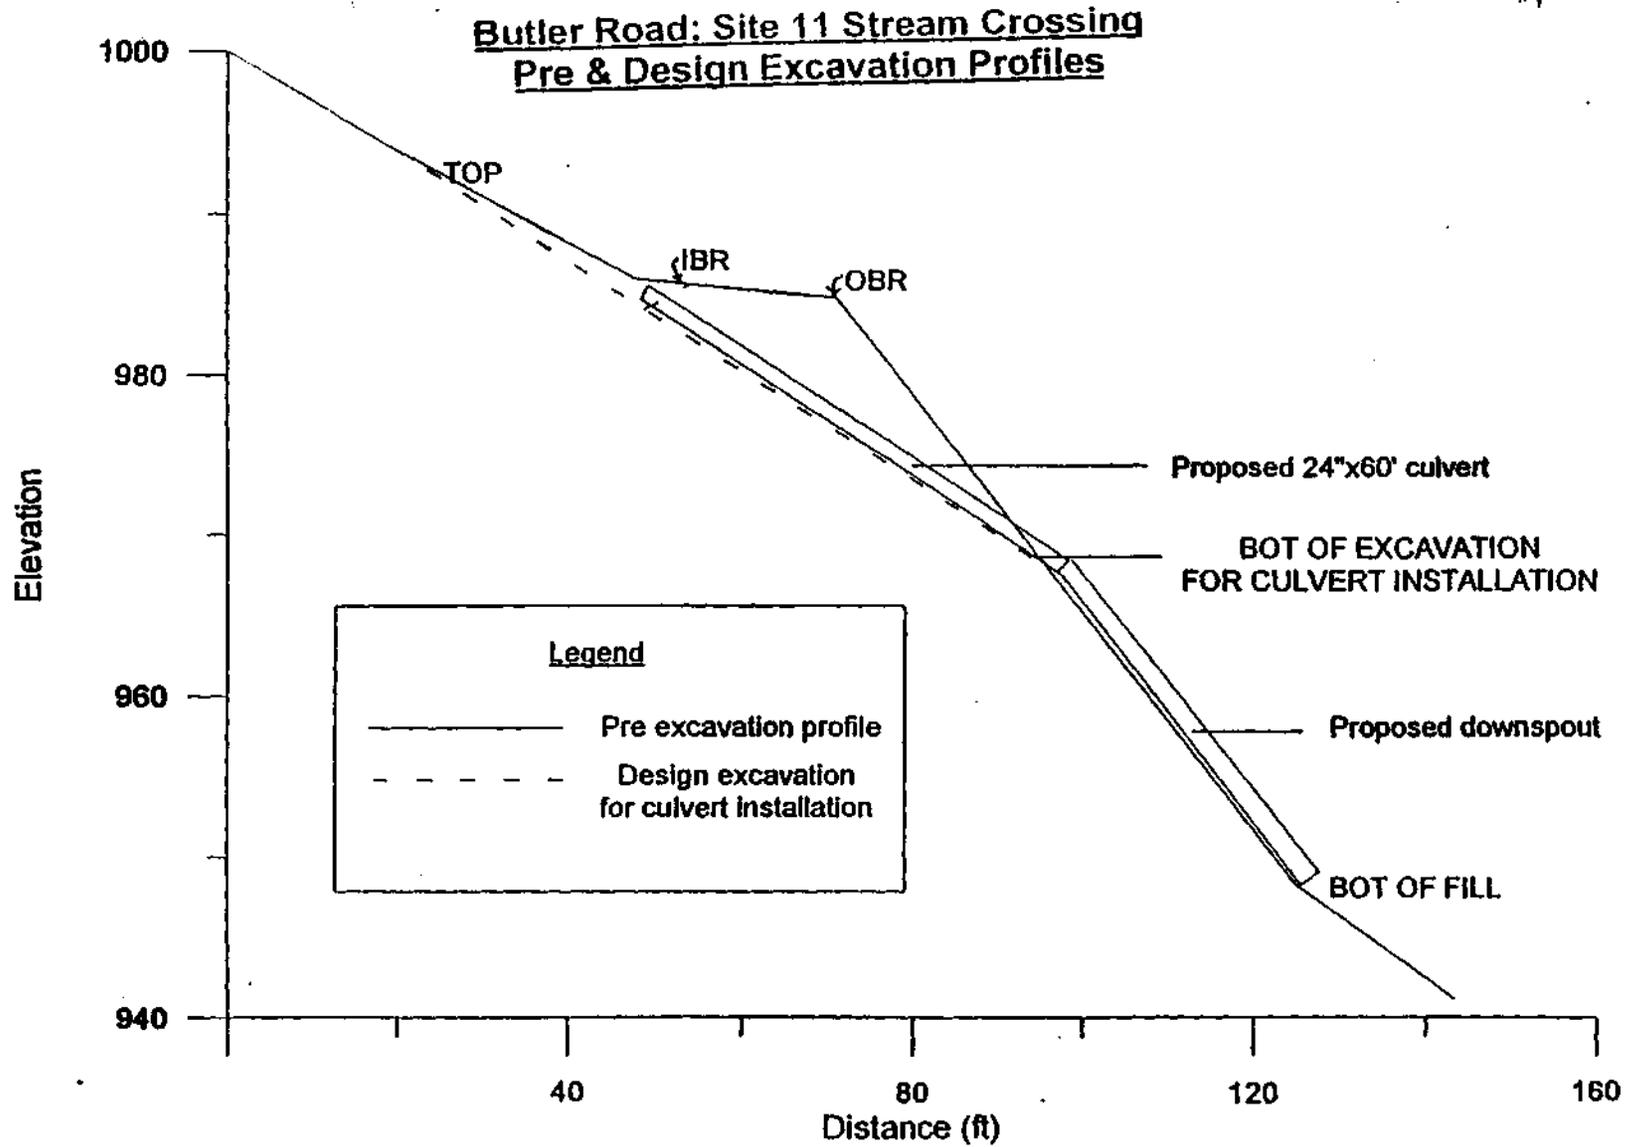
Butler Road: Site 11 Stream Crossing Pre & Design Excavation Profiles.
